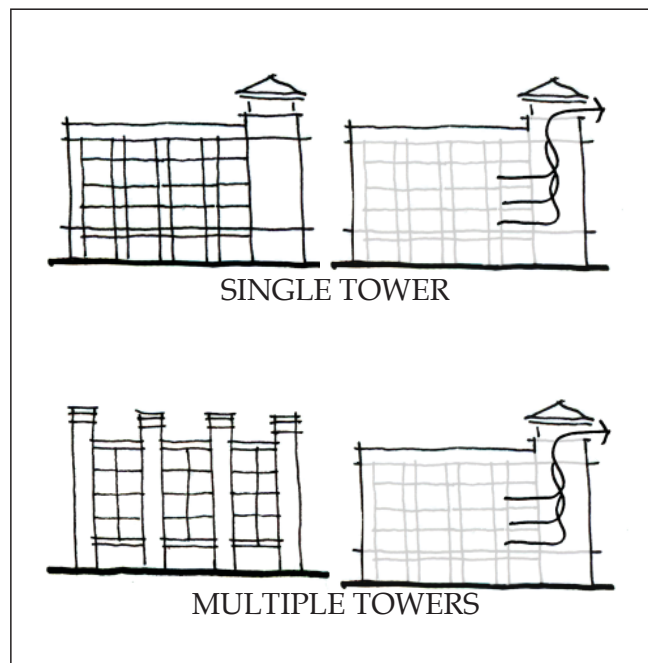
Ventilation Towers. By extending beyond the roof, towers may be used to help ventilate buildings and can find expression in a building’s architecture.
